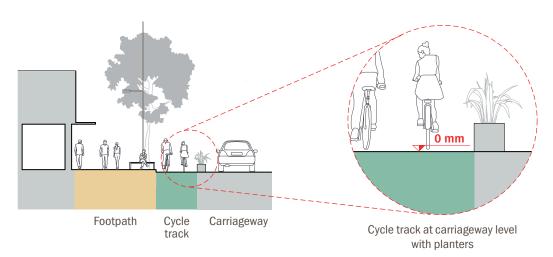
A cycle track can be developed through the installation of planter boxes or kerbs within the existing carriageway space, provided that there is adequate drainage to prevent waterlogging and accumulation of debris in the cycle track.
